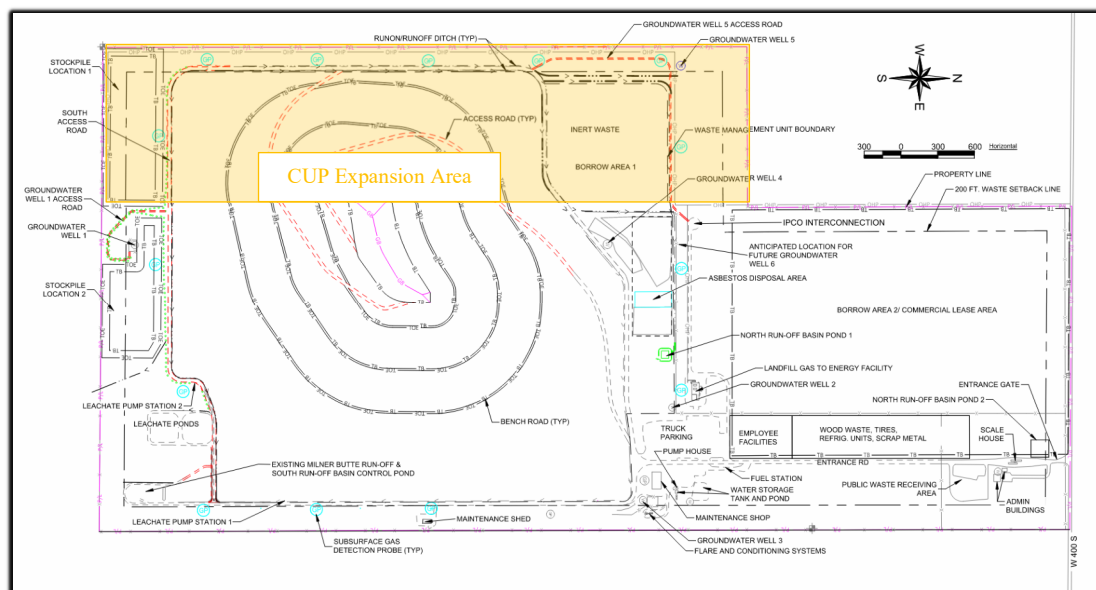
, Proposed Expansion Area with Modified Drainage Facilities
